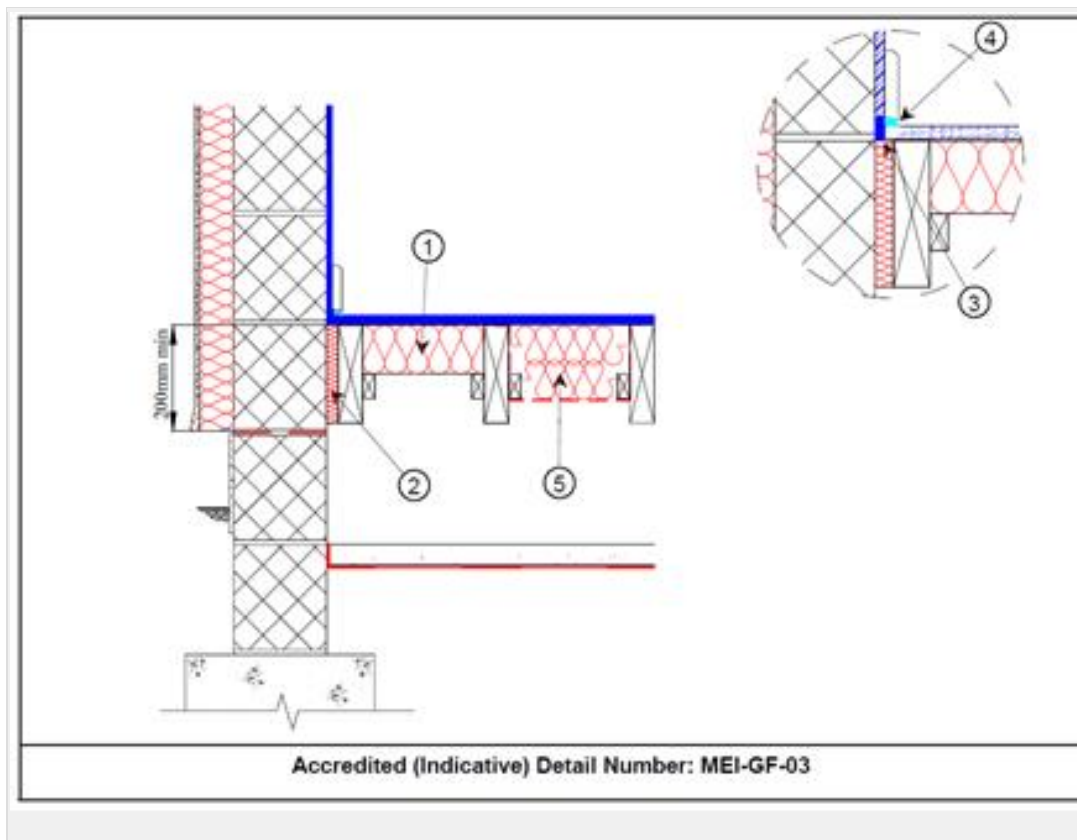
ACD for Timber Suspended Ground Floor. Extracted from ACDs for Masonry External Wall insulation.
